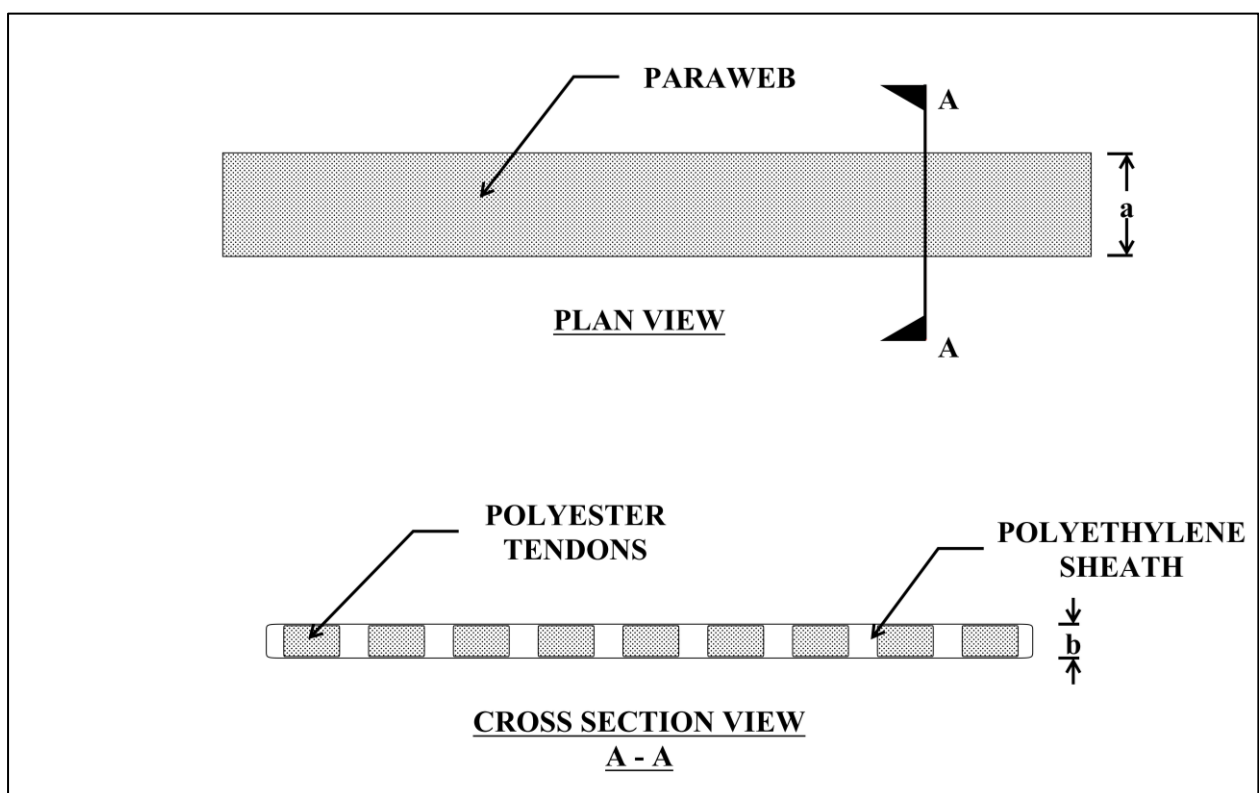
Typical Plan and Cross Section of ParaWeb
